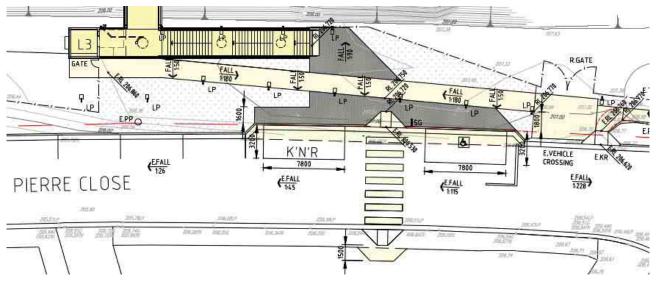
Proposed Connection to Footpath and Kiss and Ride Area on Pierre Close
